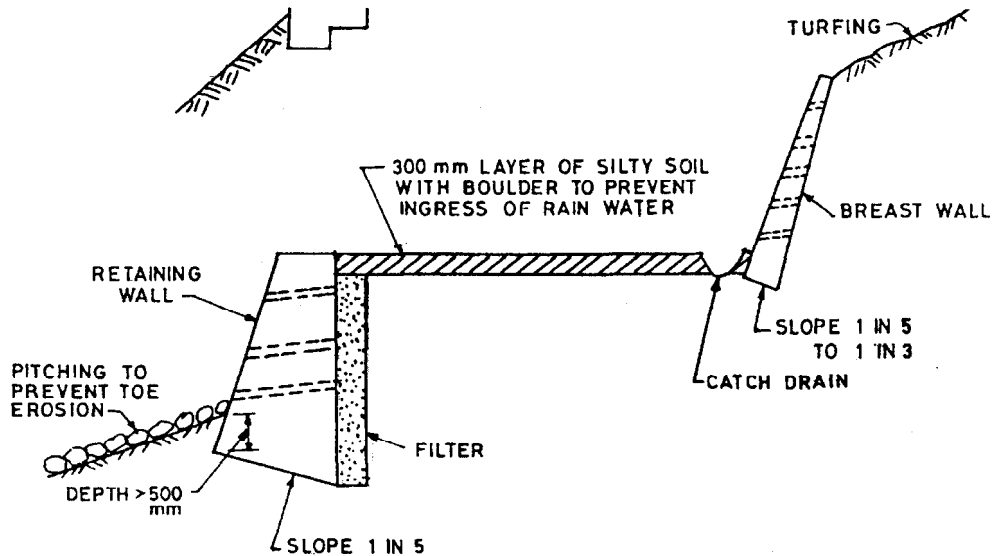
TERRACE DEVELOPMENT FOR BUILDING COMPLEXES WITH RETAINING WALL AND BREAST WALL
